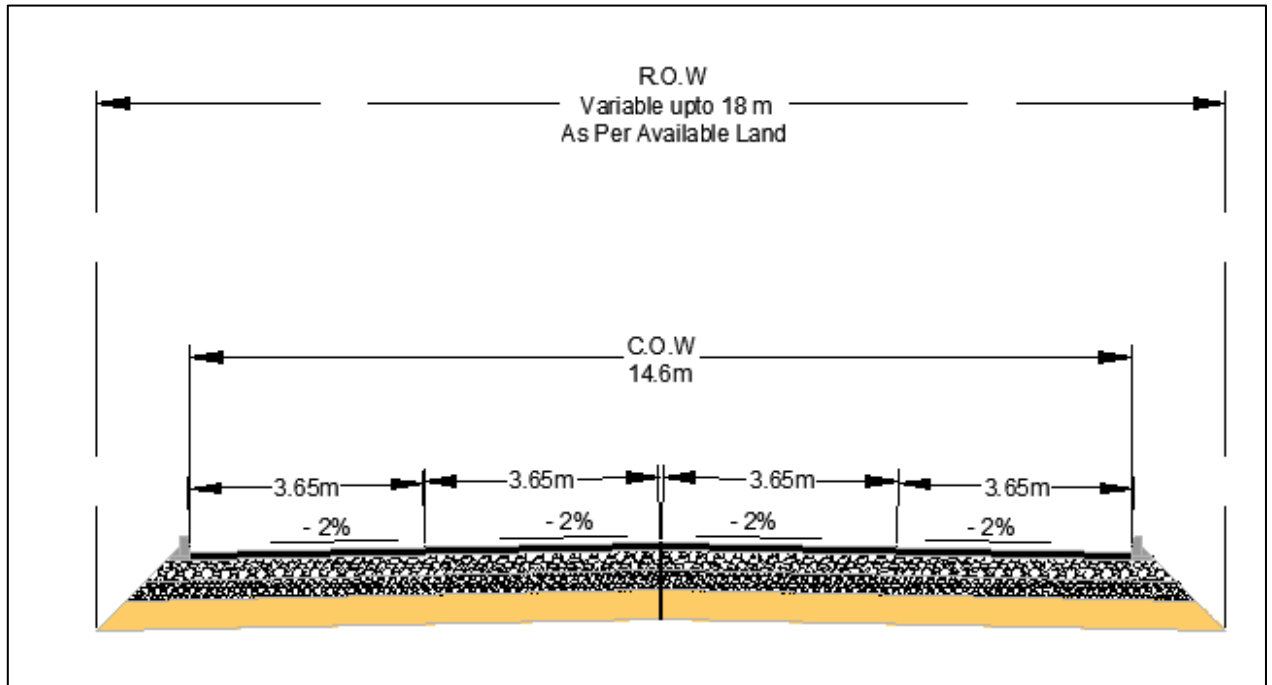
Proposed Road Cross Section for Upgradation/Improvement
